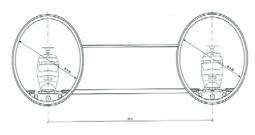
Railway tunnels with simple parallel way, spaced and connected by galleries
